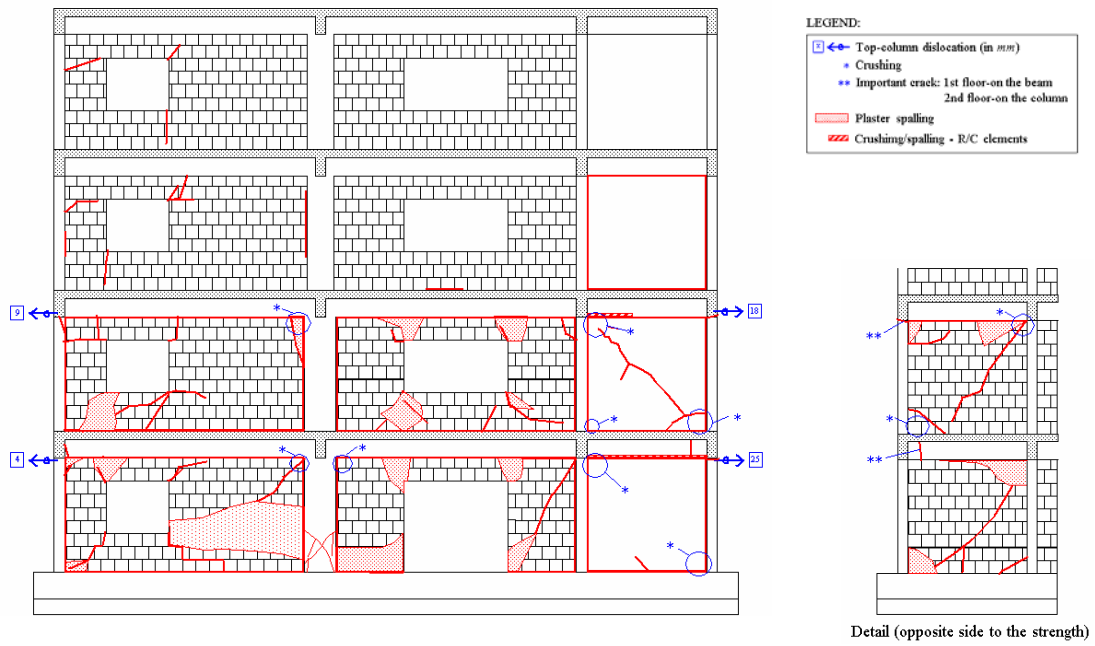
Damage pattern after the infill strengthened frame tests (general layout)
